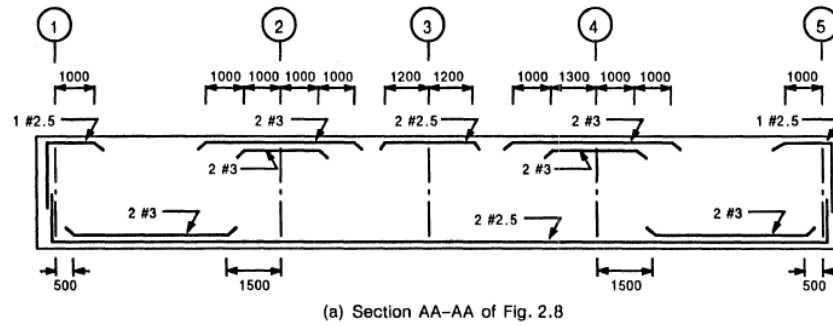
Details of typical floor joist (Downs, et al., 1991)
